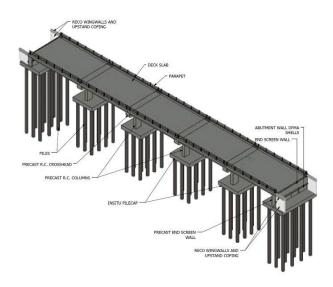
3D view of the A453 widening project Soar Floodspan Viaduct bridge
